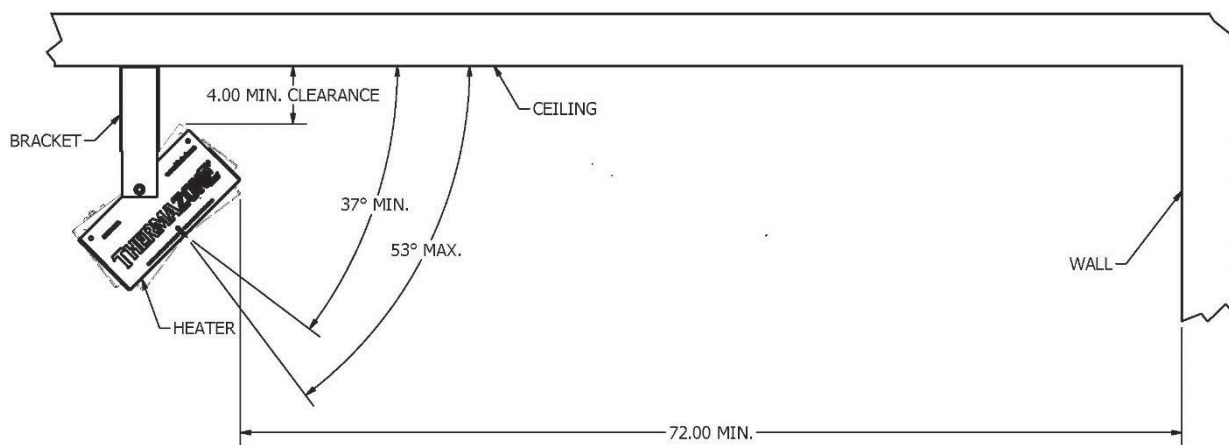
CEILING MOUNTING ANGLED TOWARDS VERTICAL SURFACE
